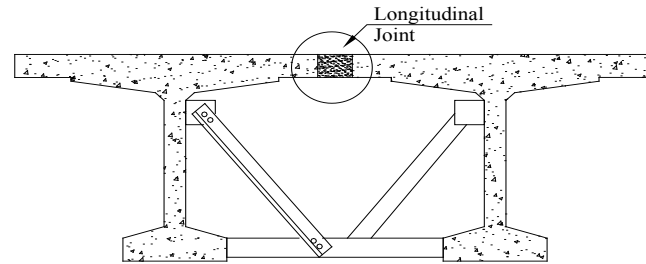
Steel diaphragm connecting adjacent girders at midspan
